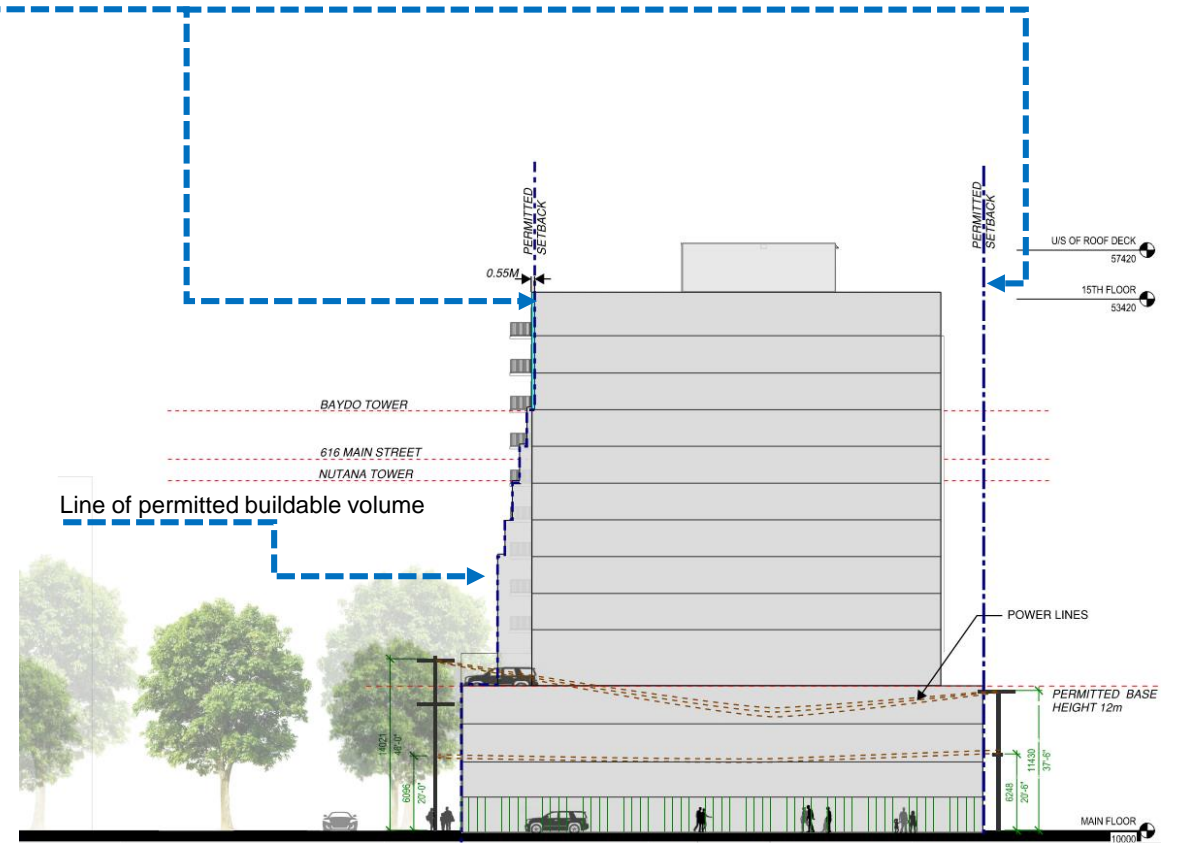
Permitted Buildable Volume, Dufferin Ave Elevation
